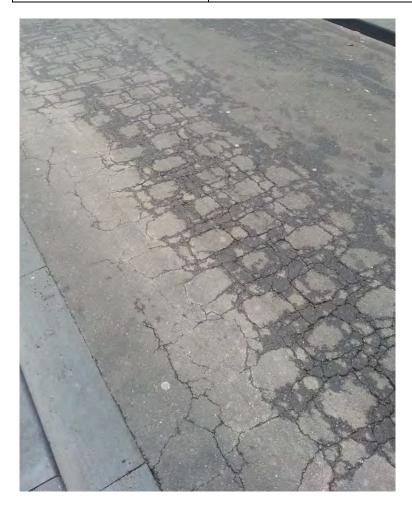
Westwood Place (prior to reconstruction) – Removed original pitchers overlaid with asphalt and reconstructed in asphalt pavement
